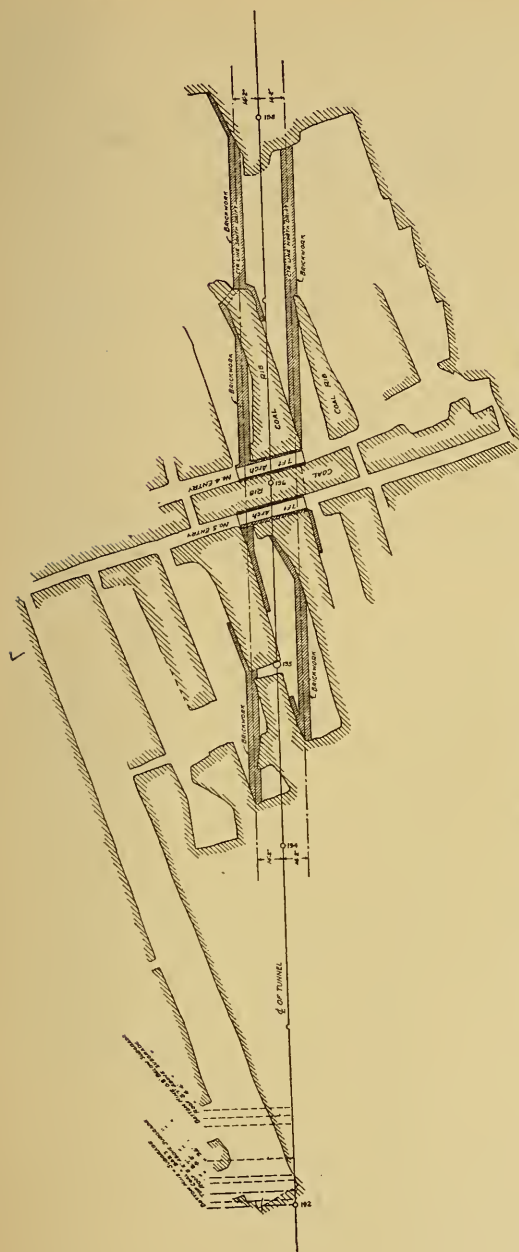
PLAN OF GREENTREE TUNNEL AND OLD MINE WORKINGS.
